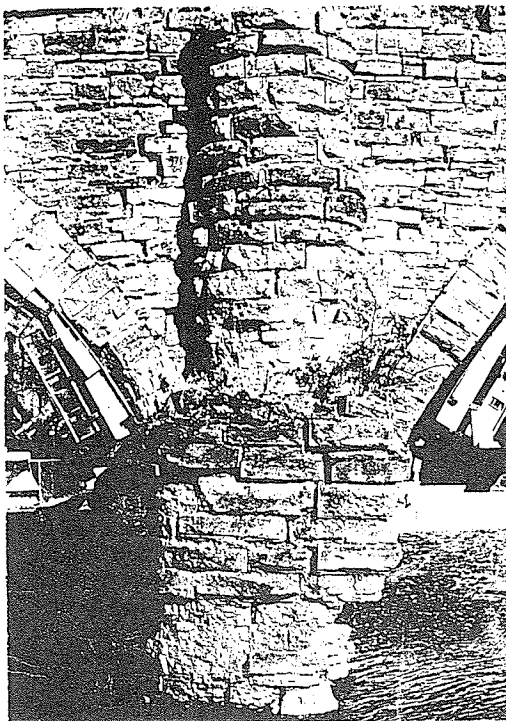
Pier 1, south side - cracking and undercutting below arch springing.
